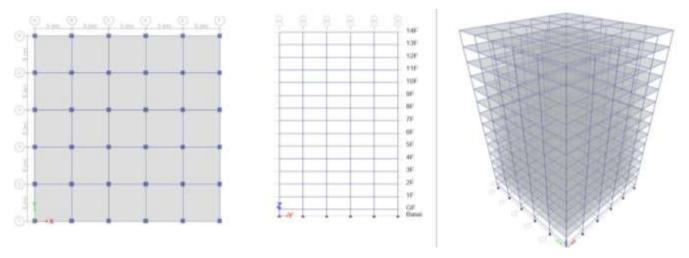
Plan view and elevation and 3D view of Regular building model
